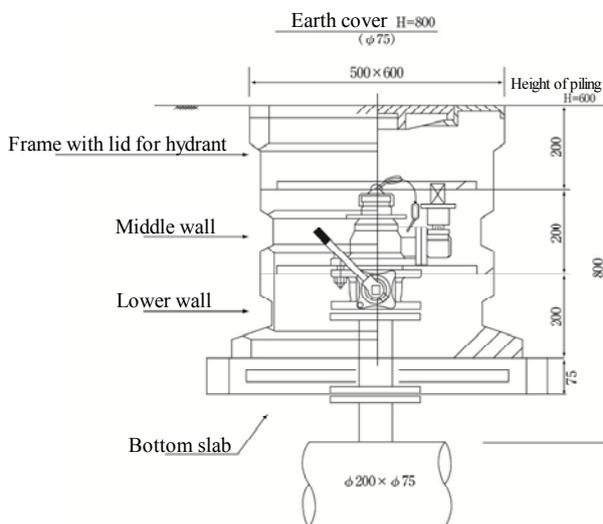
Example of installation of a box for the single-jet hydrant
